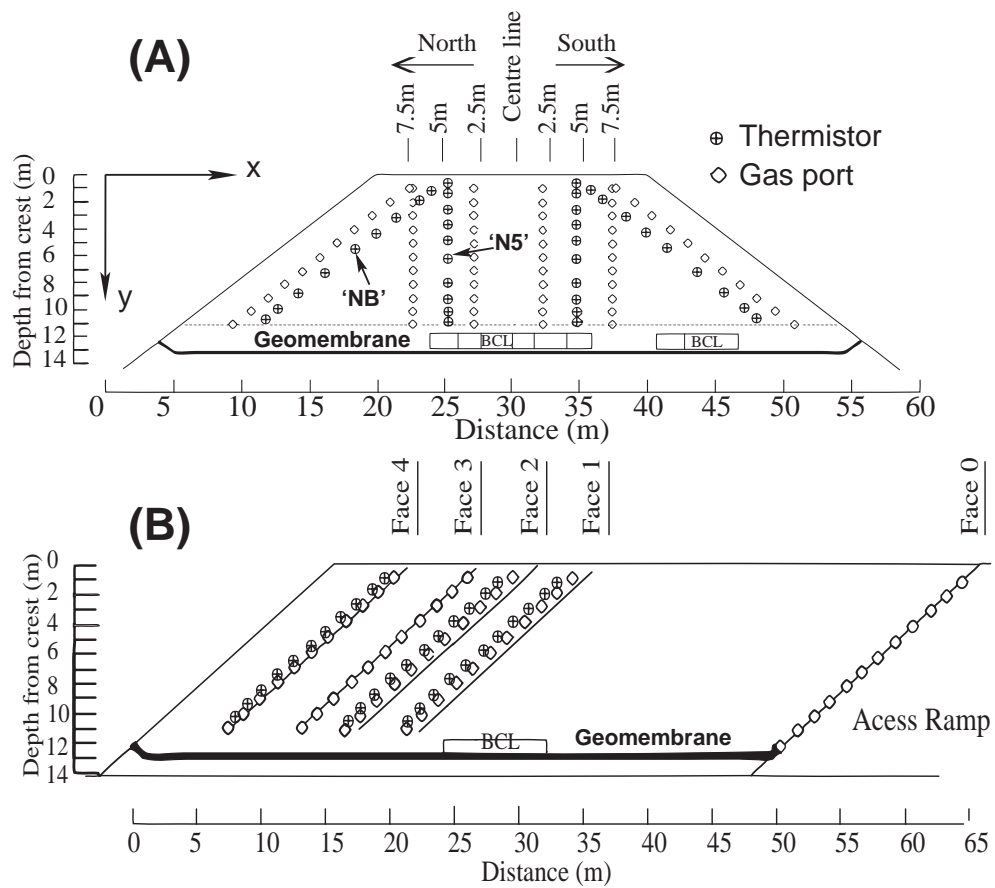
Typical cross-section (A) and long section (B) of the Type III pile
